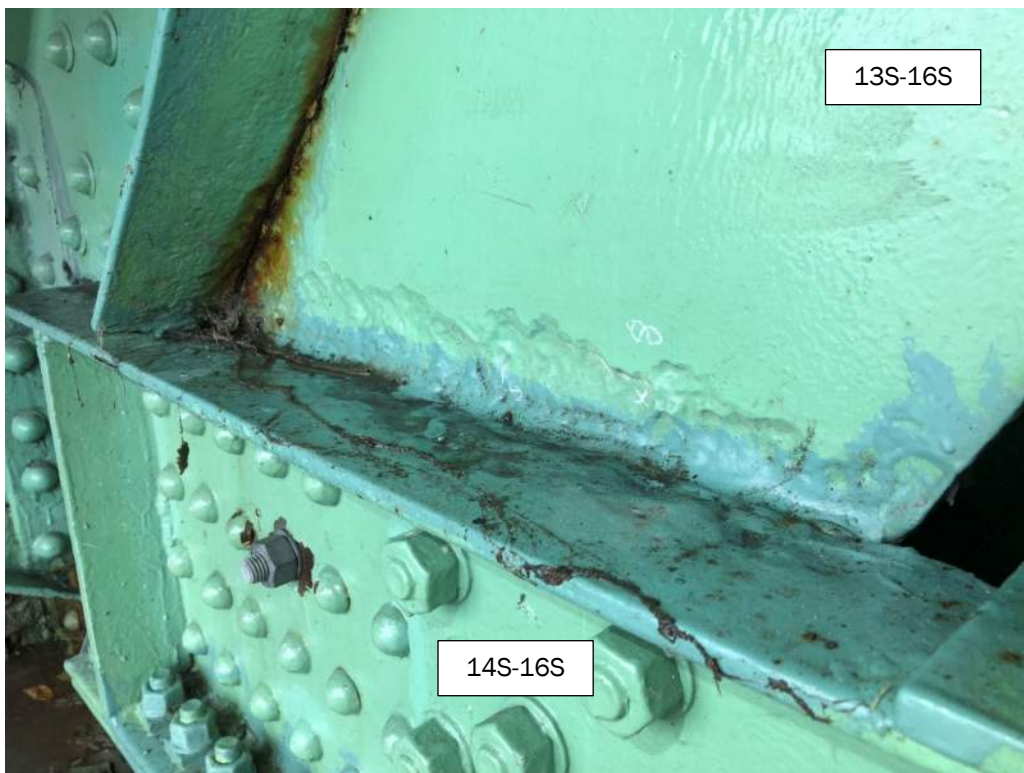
Severe pitting in south exterior gusset plate near 16S (photo by Brouco NDT).
